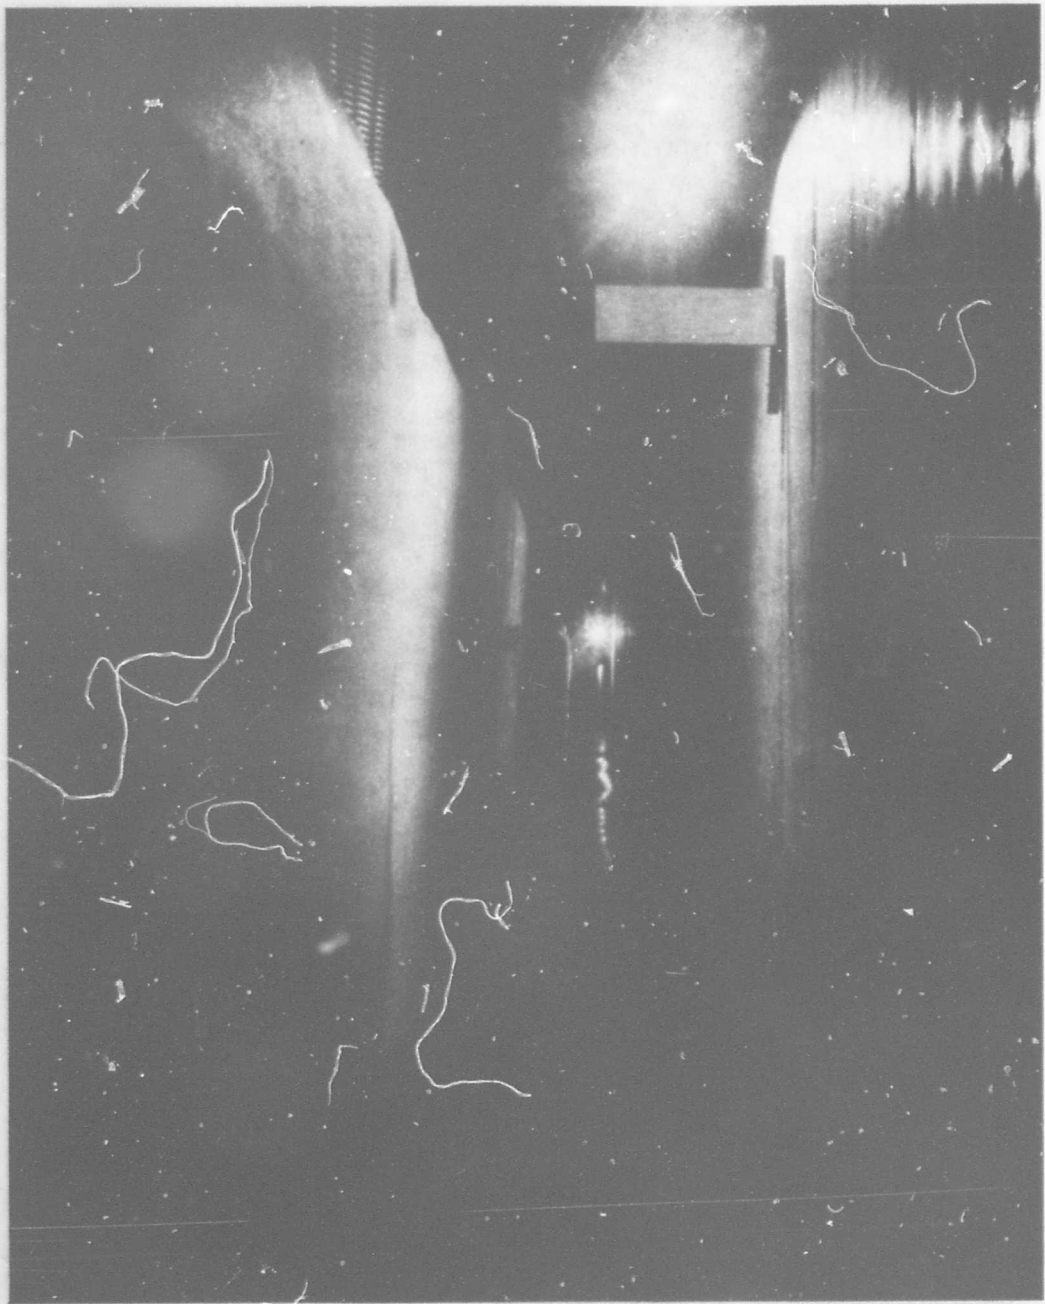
Walkway on north side of quarters building in tunnel L-5. Snow walls trimmed 12 months previous.
